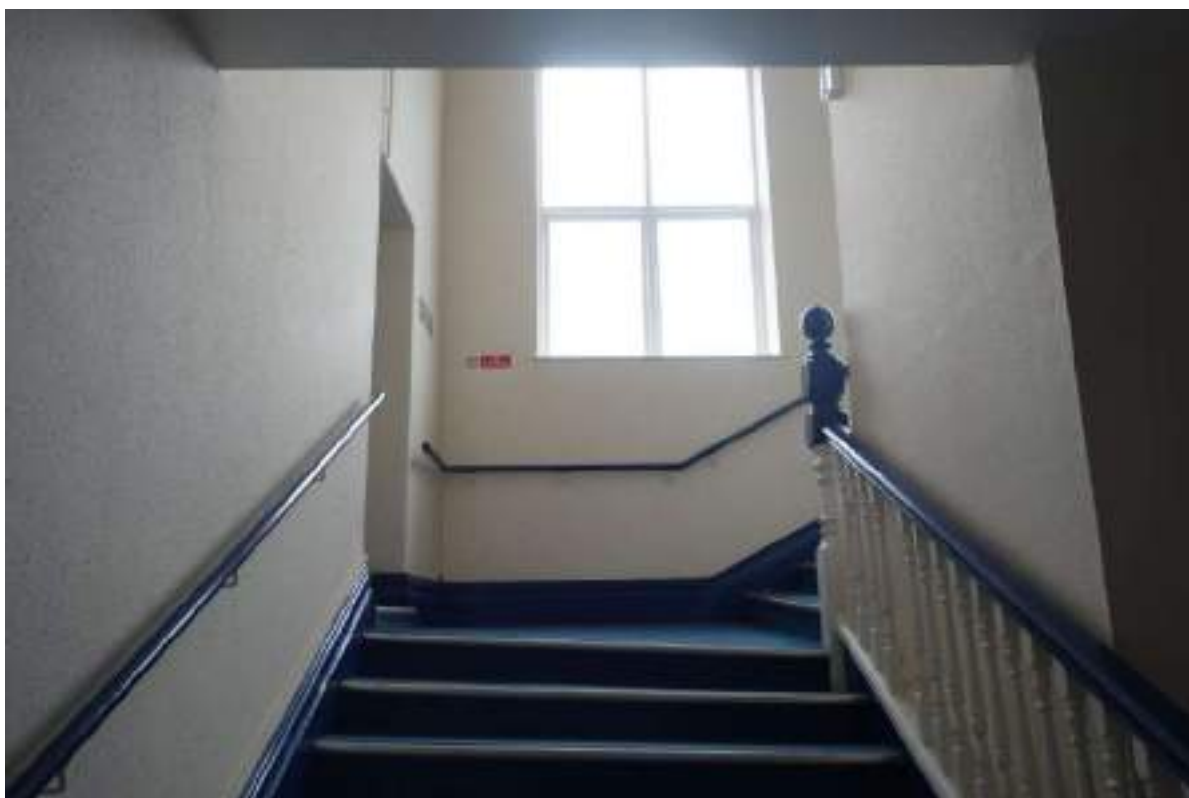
View looking N up the first flight of the main staircase (SF to TF).
